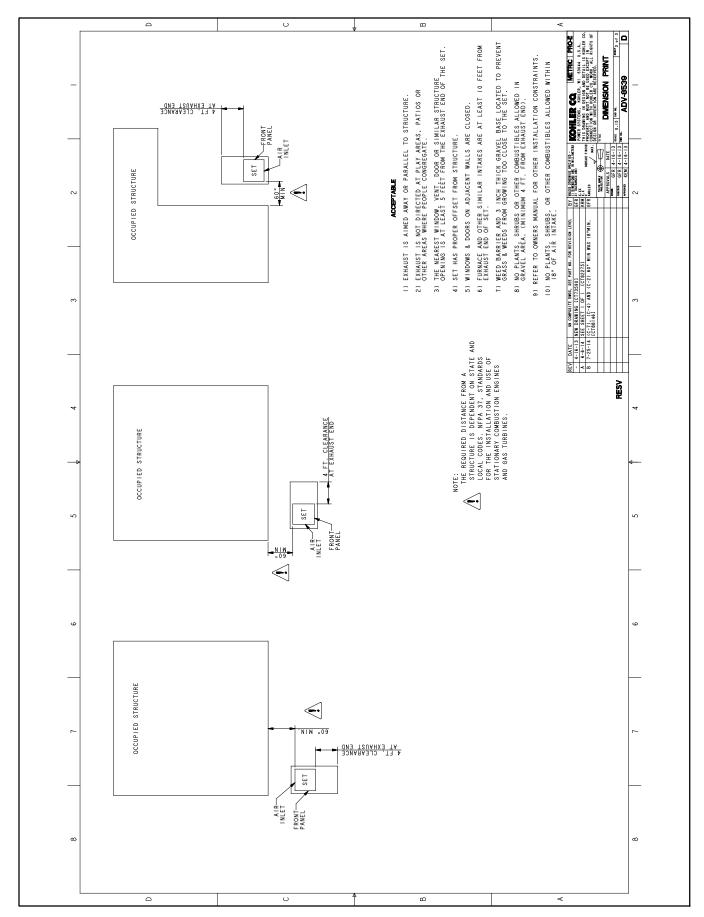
Dimension Drawing ADV-8539, Sheet 3 (for specification numbers GM88347-GA6 or lower)
